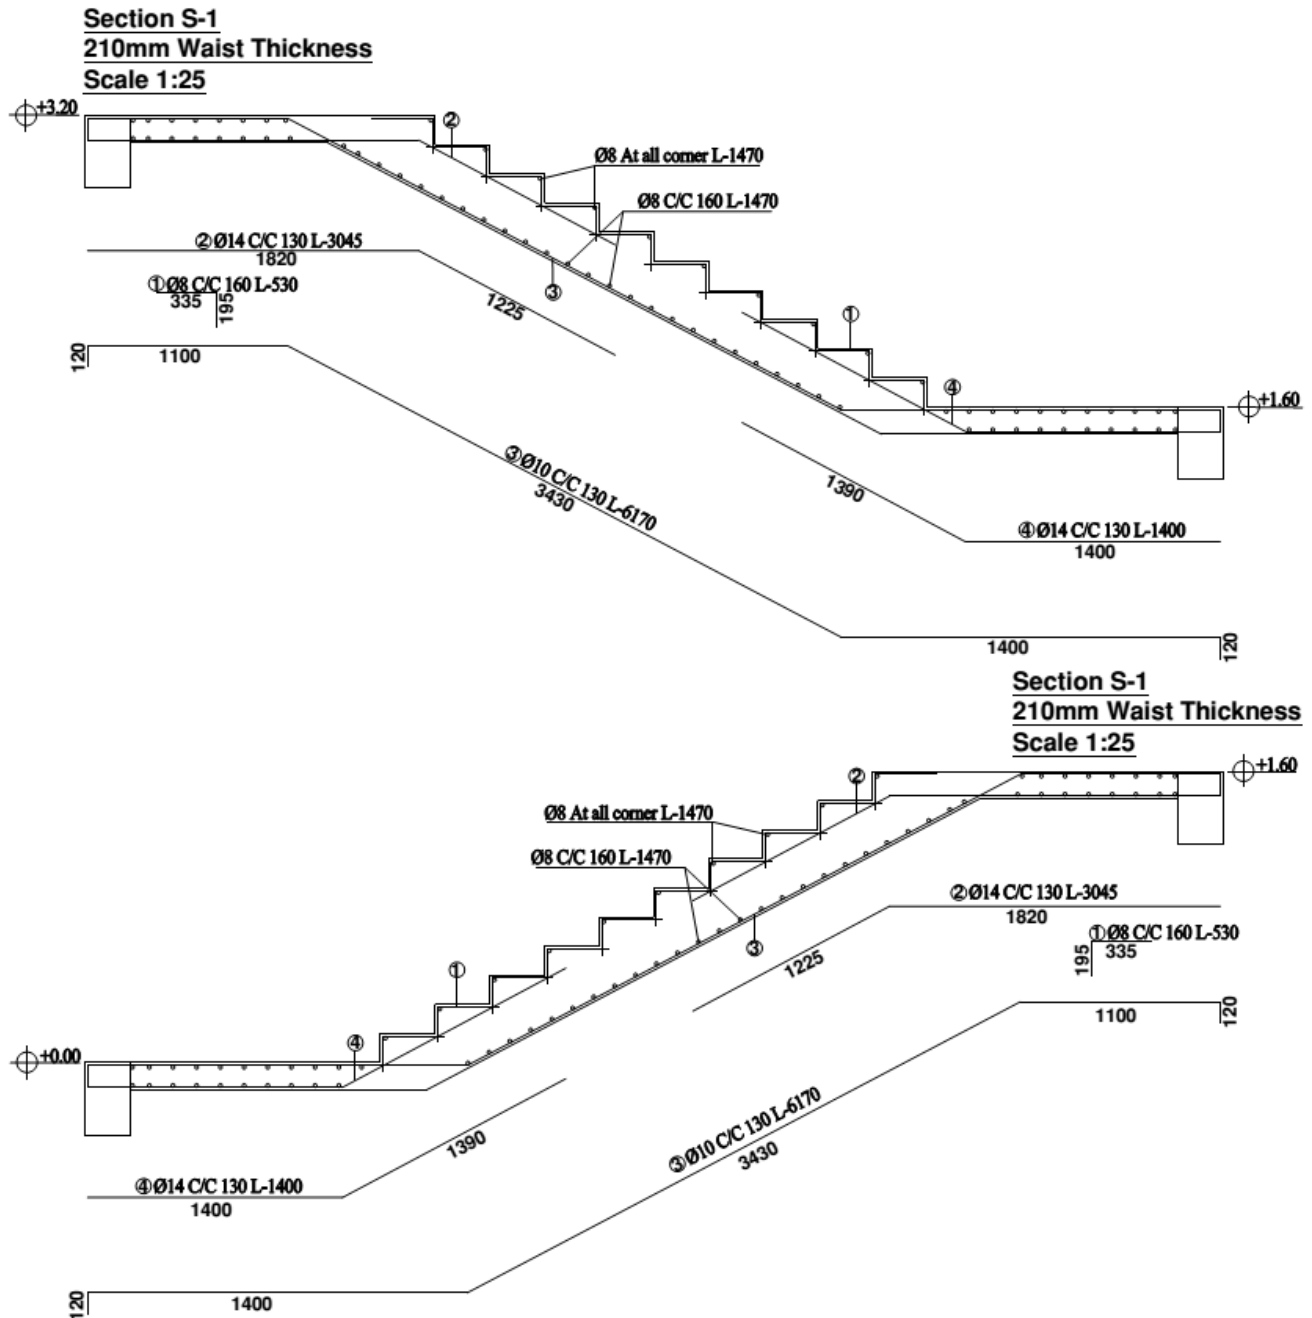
Sample staircase detailing for G+2 building with C-40 concrete
